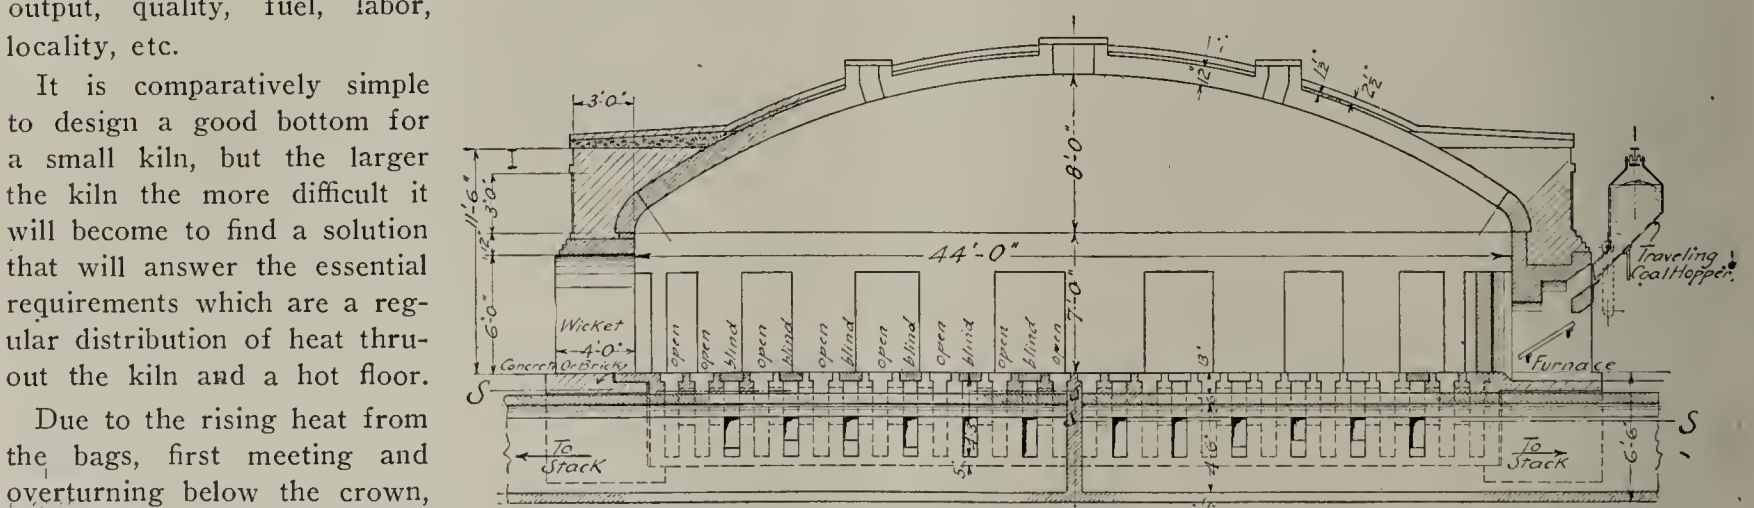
A Sectional Elevation Along Center Line of a Large Kiln With Two Stacks. Note the Arrangement of the Traveling Coal Hopper.
